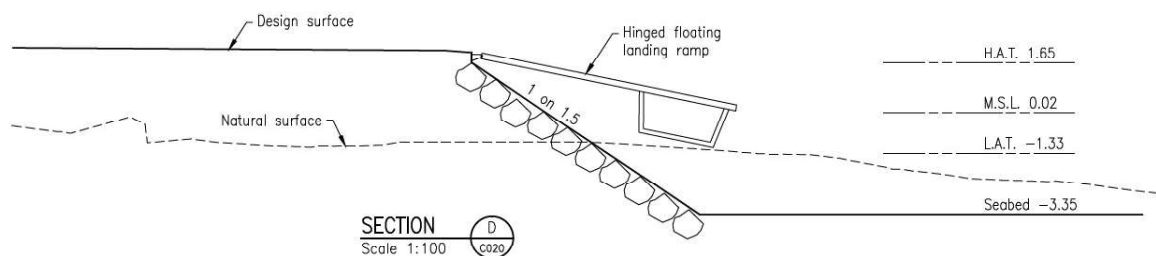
Cross section for eastern seaward rockwall slope<sup>13</sup>
